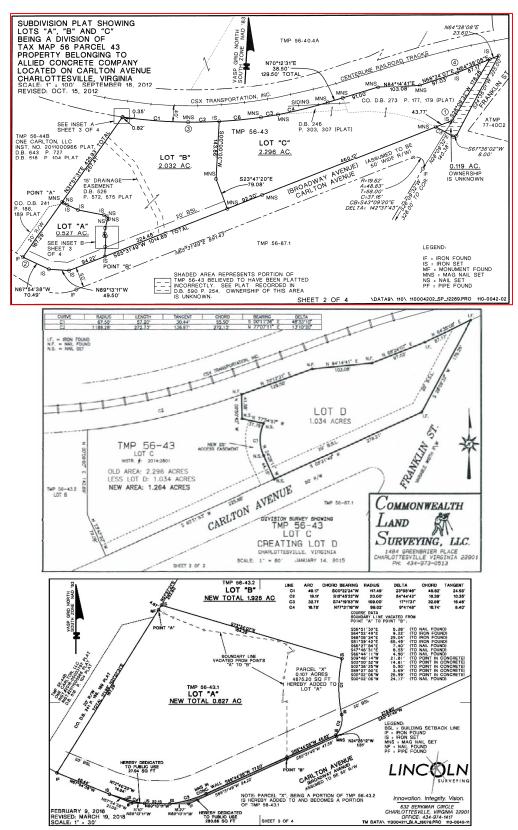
Existing Subdivision Plats CARLTON VIEWS PUD APPLICATION
